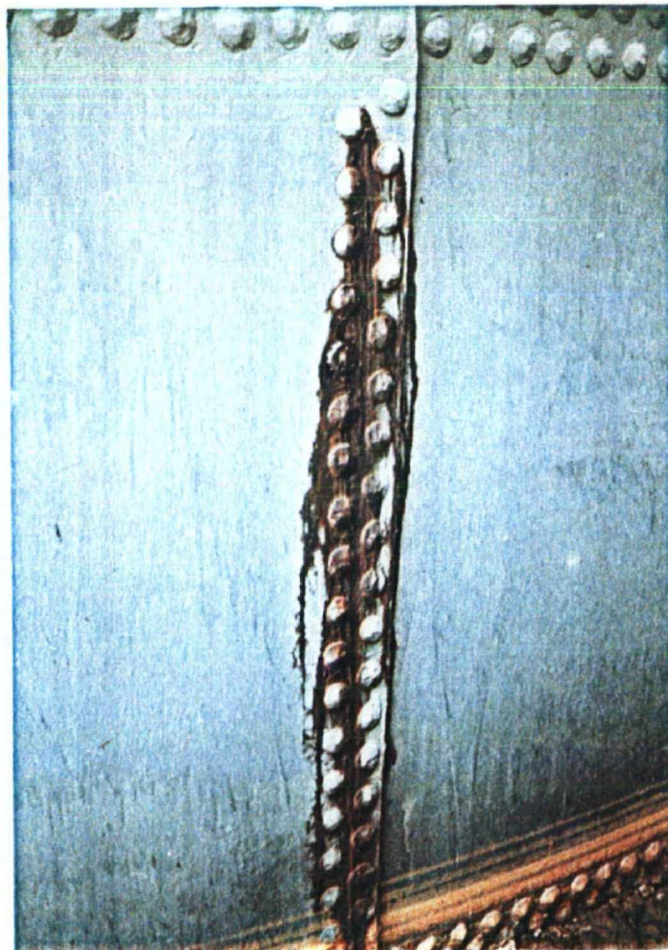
Oil Seepage from Plates & Rivets, Tank A-7.
